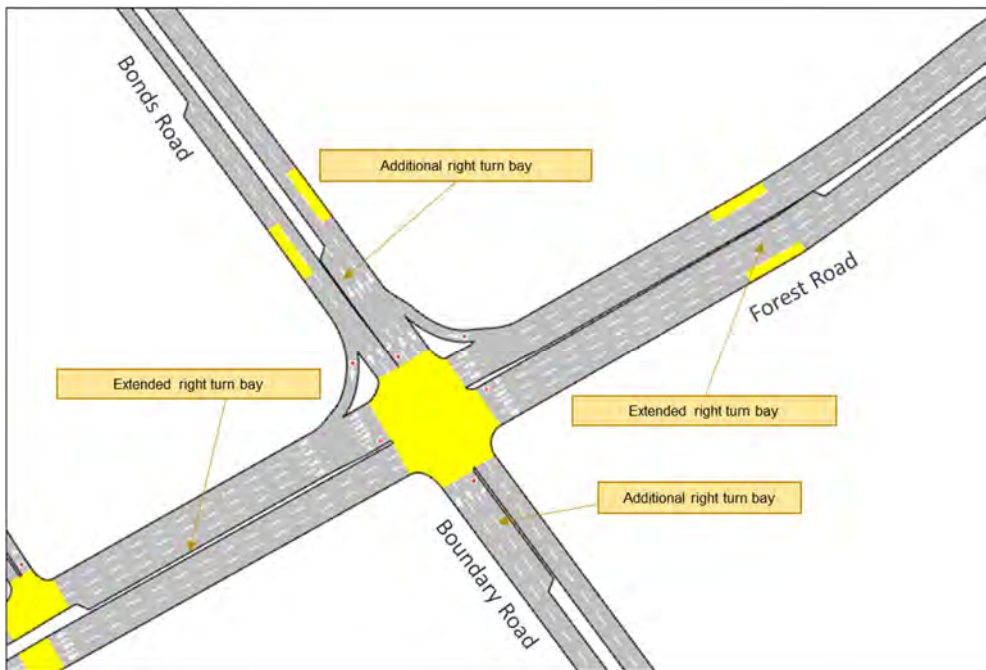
Bonds Road/Forest Road/Boundary Road (2031)
